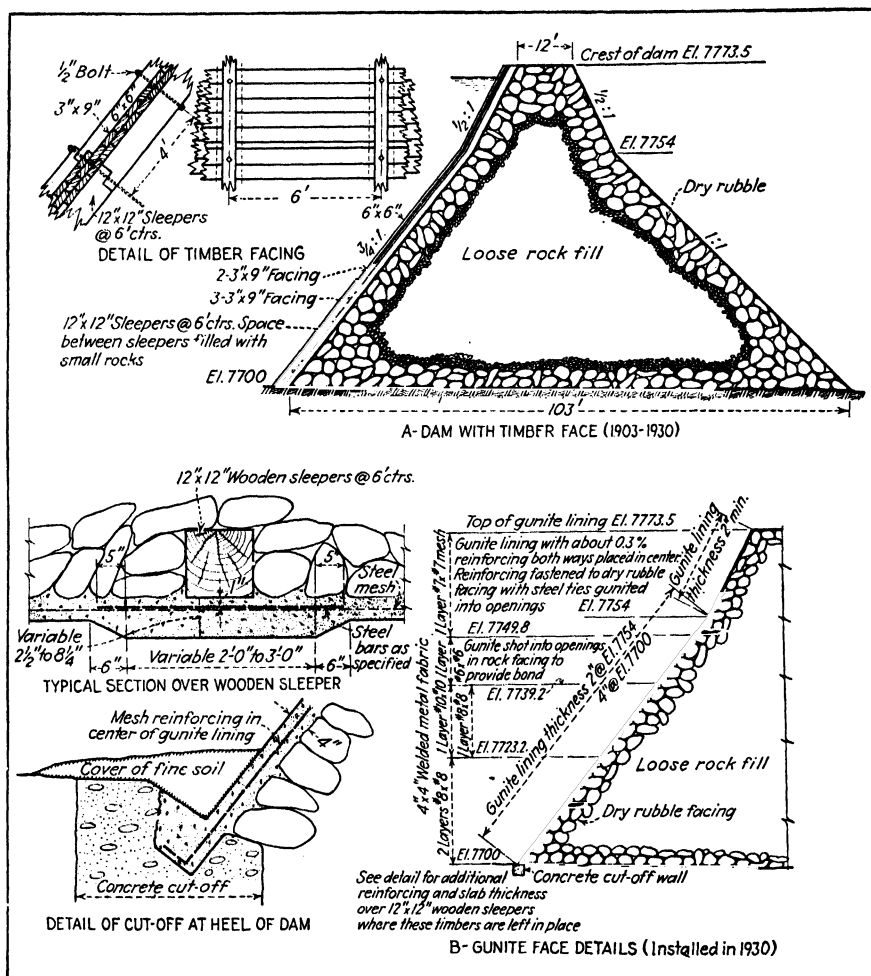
Meadow Lake Dam, Alpine County, California, Pacific Gas and Electric Company. (A) Section of dam showing timber face, 1903-1929. (B) Details of gunite face, 1930.
